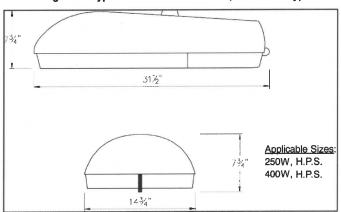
Typical Horizontal Luminaire, Flat-Glass Type with Power Door
